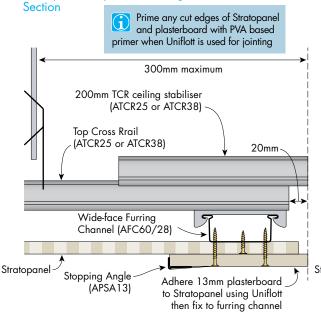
Perimeter Detail - Proud Border Stratopanel Suspended Ceiling Frame Section
